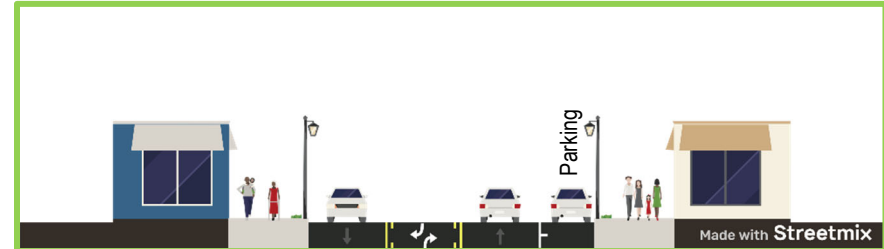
Recommended Geometry – 11-Mile Road Corridor
